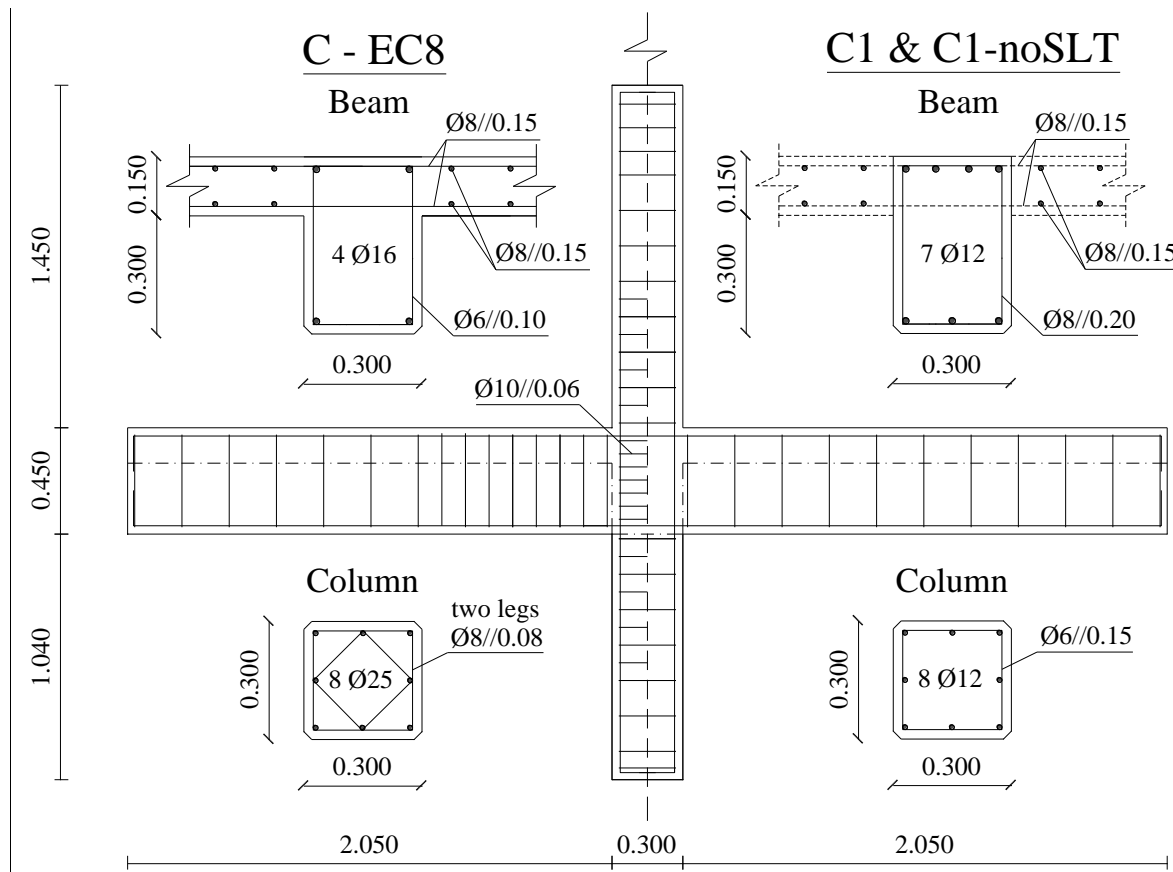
Schematic of the geometry and detailing of the full-scale RC joint sub-assemblages tested. Note: the left side of the figure shows reinforcement details for specimen C EC8; the right side of the figure shows the reinforcement details for specimens C1 and C-noSLT (dashed line indicates slab for C1).
